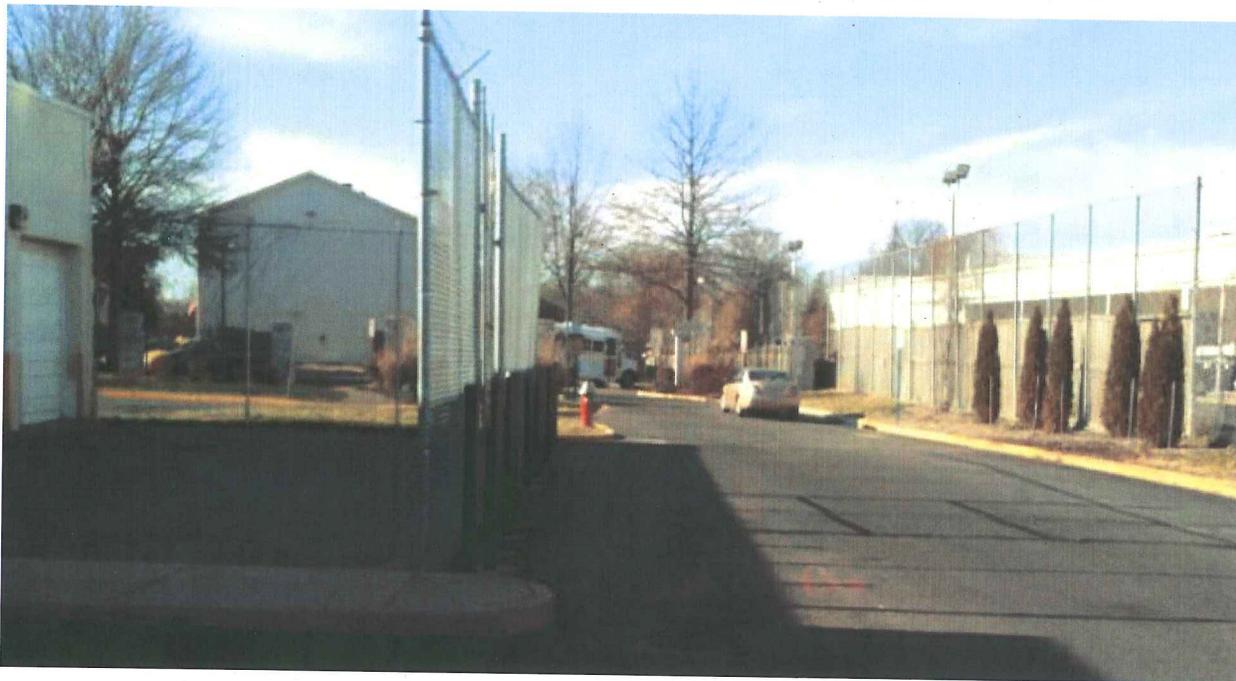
The striped path would be located between the concrete island in the foreground and the fire hydrant in the background. The bollards and fencing shown in the site photo, installed by the applicant to prevent overnight parking, would be removed if the Special Exception were to be approved (Source – Fairfax County DPZ Staff site visit, 1/6/2012)
